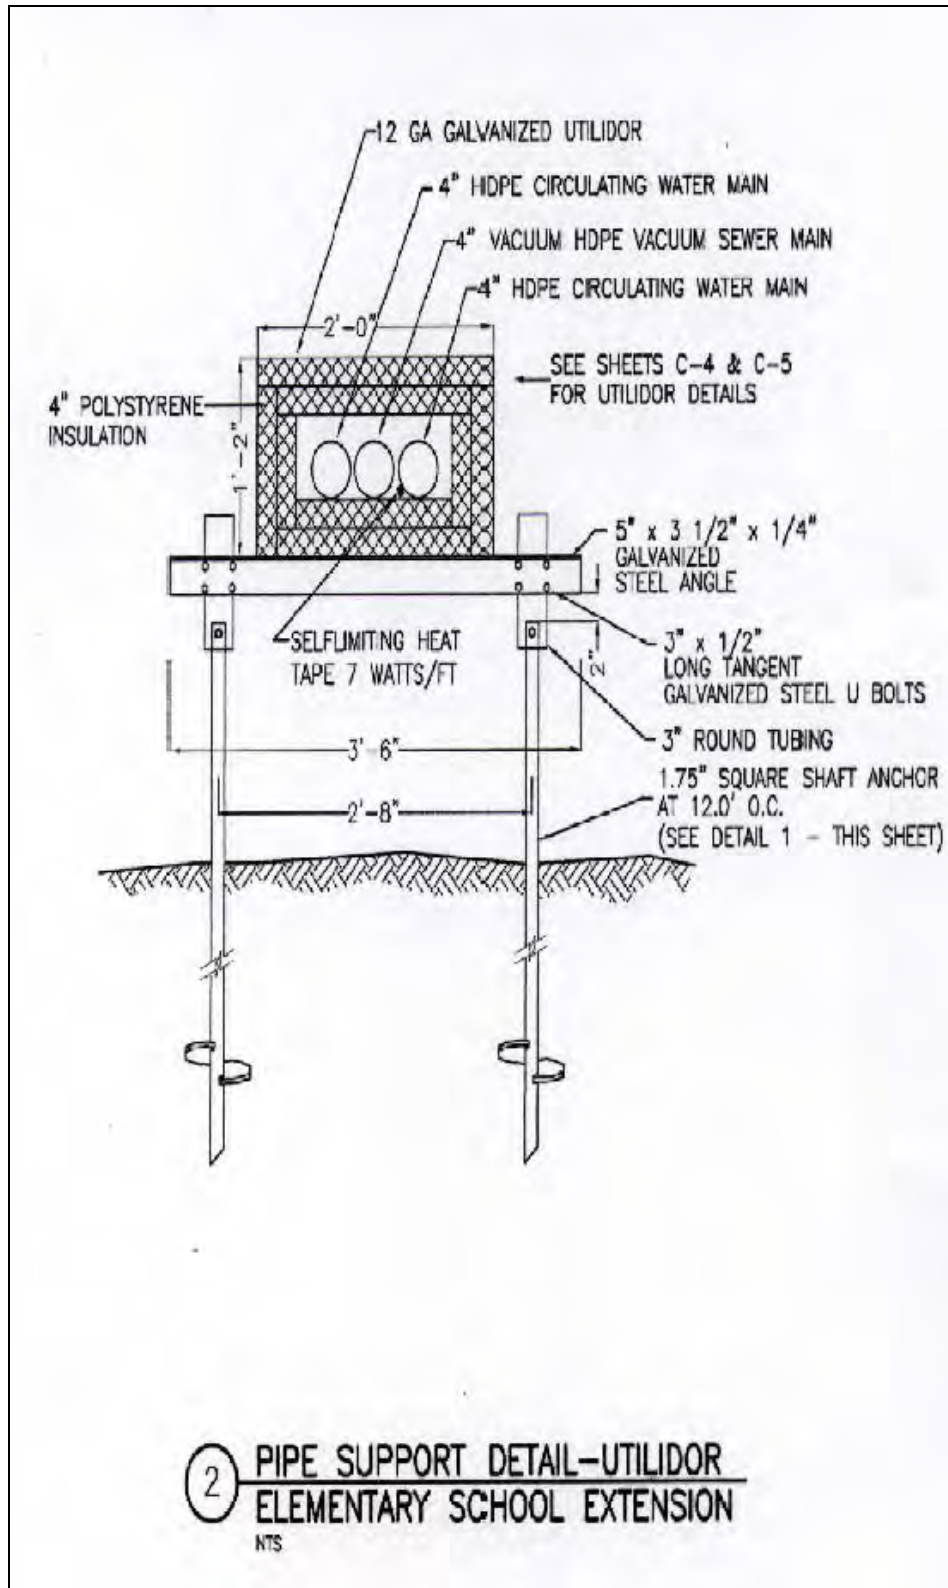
Typical Detail for Helical Piers as Used in Noorvik for the Utilidor and Arctic Pipe Installation (ANTHC, DEHE)
